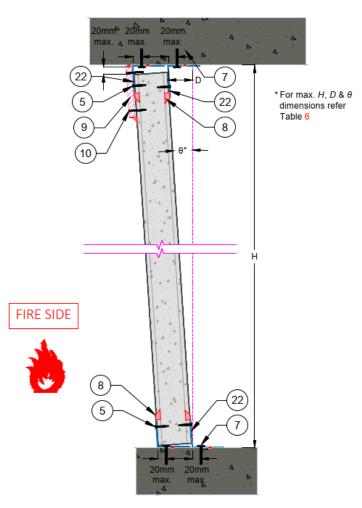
Inclined vertical Speedpanel wall – 78 mm system only
